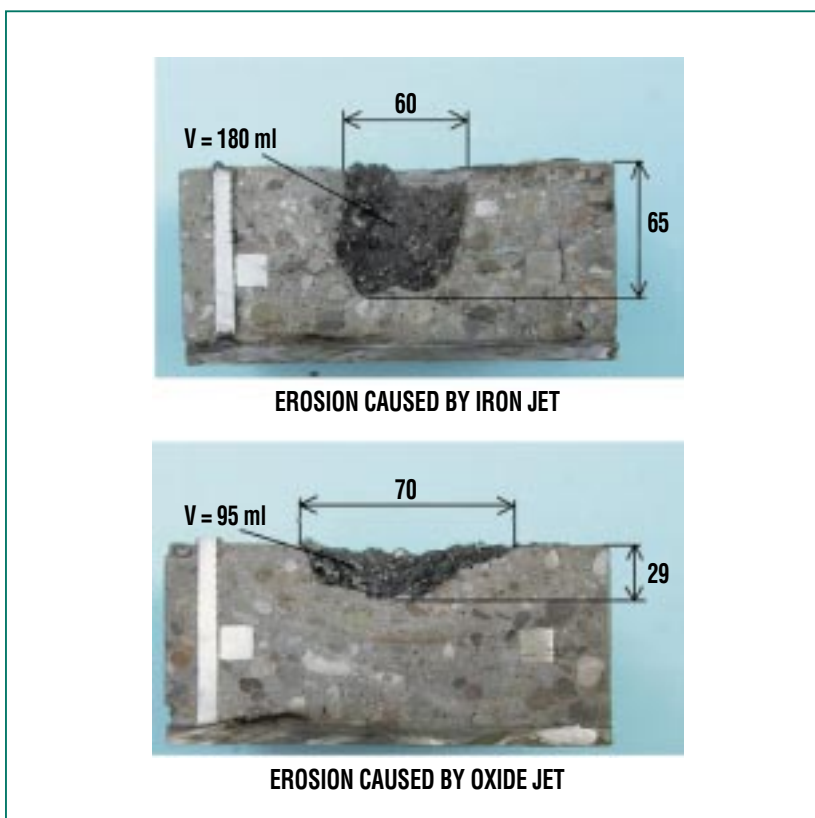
Cross section through the concrete test specimens (dimensions in mm).
